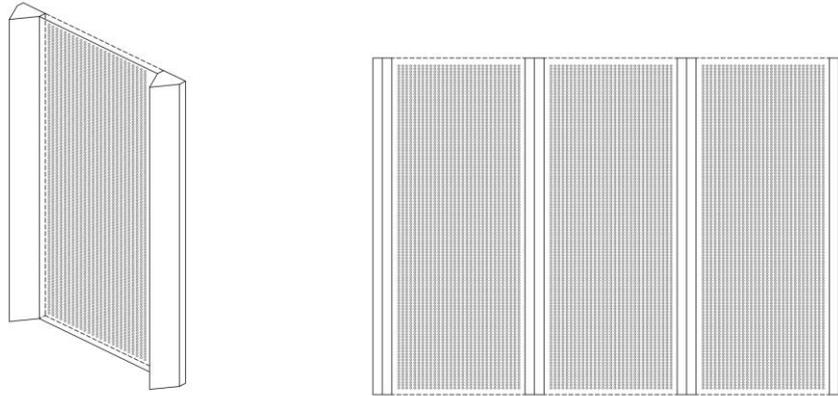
Axonometric and elevation view of vertical acoustic panels between lamellas
